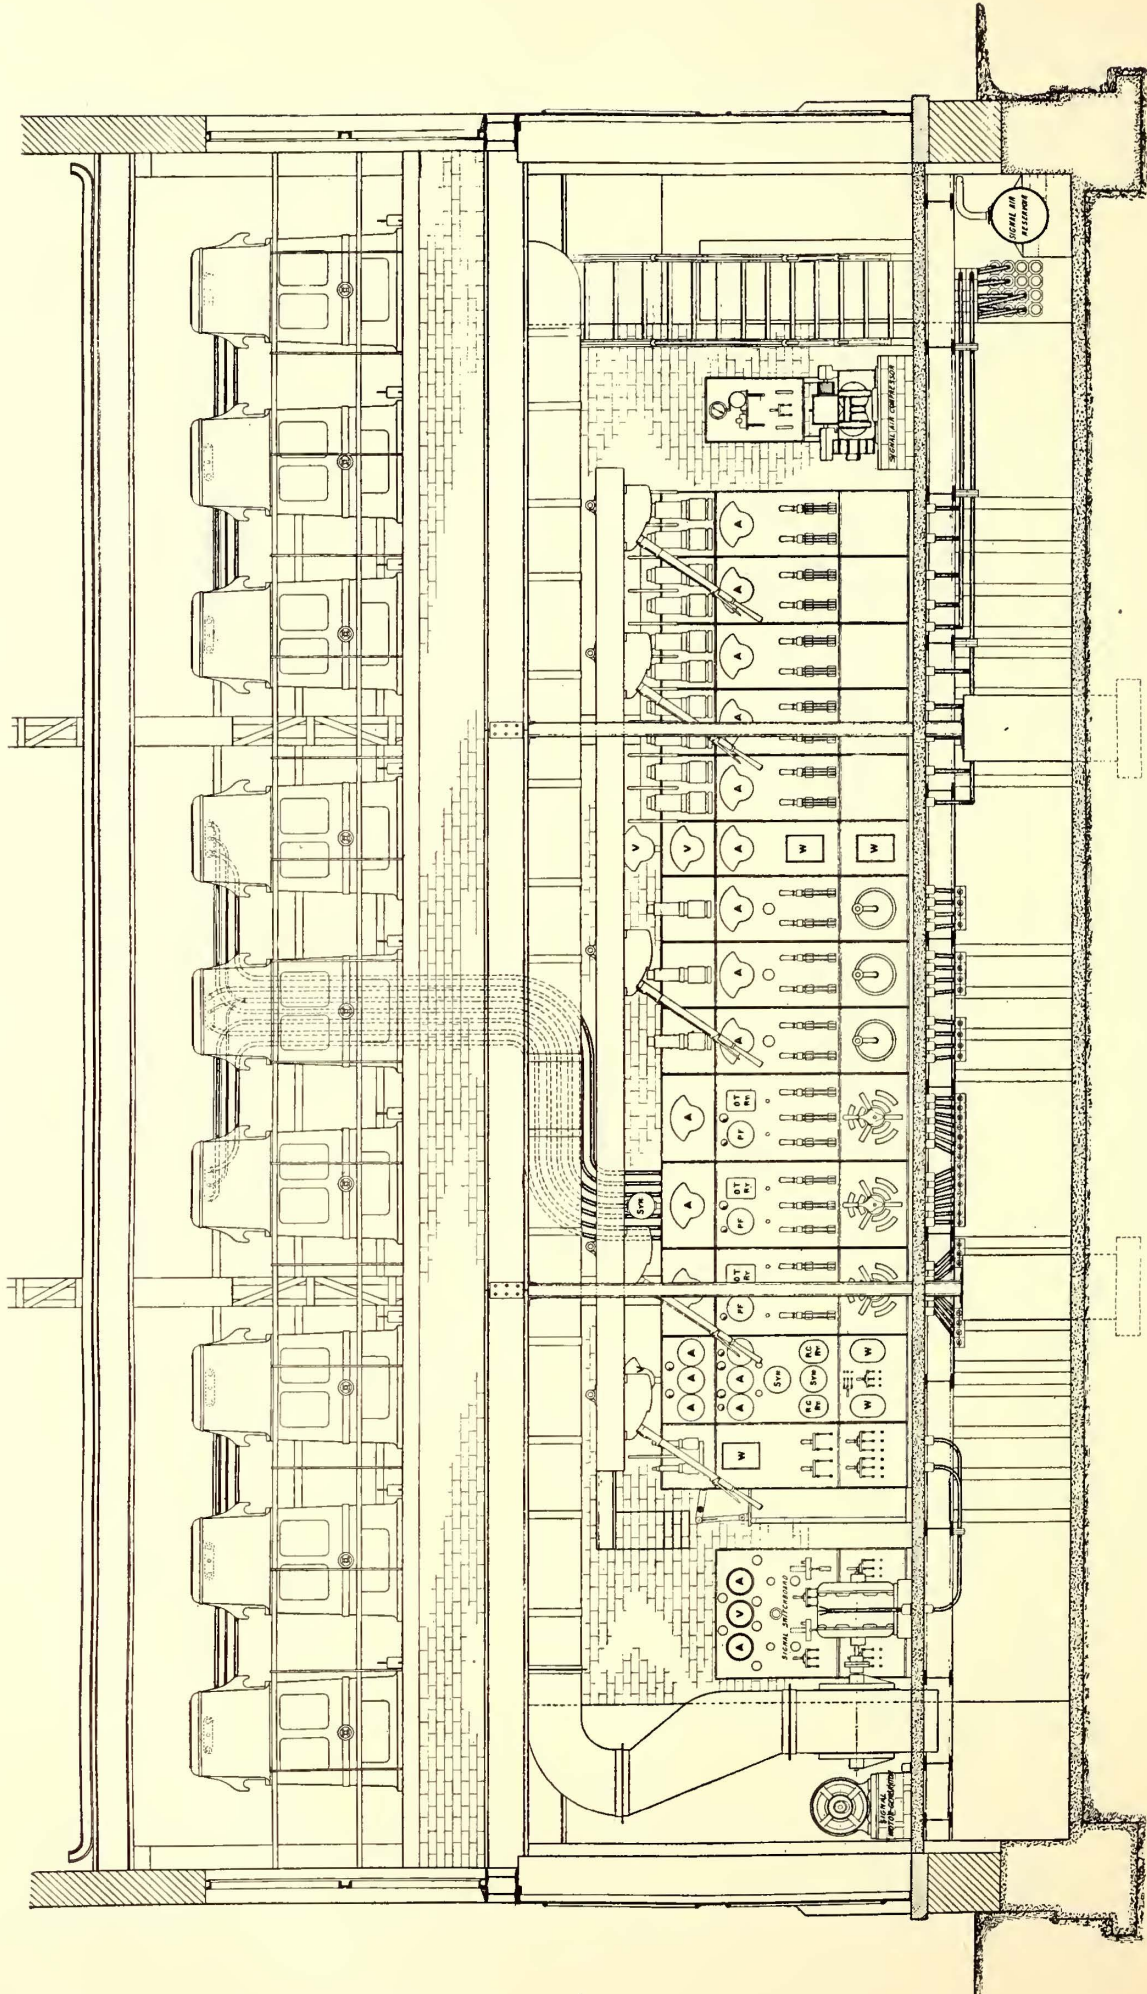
LONGITUDINAL SECTION OF PUTNEY BRIDGE SUB-STATION
